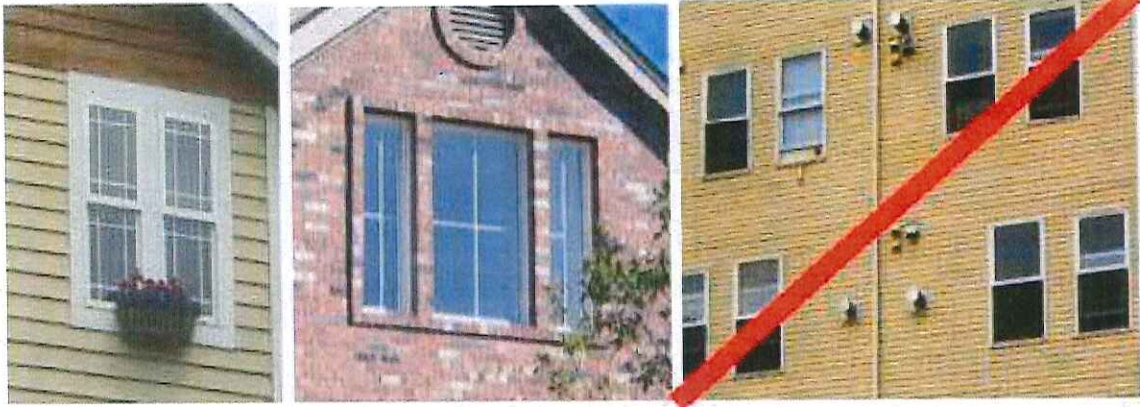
Acceptable (left and middle) and unacceptable (right) window design.
